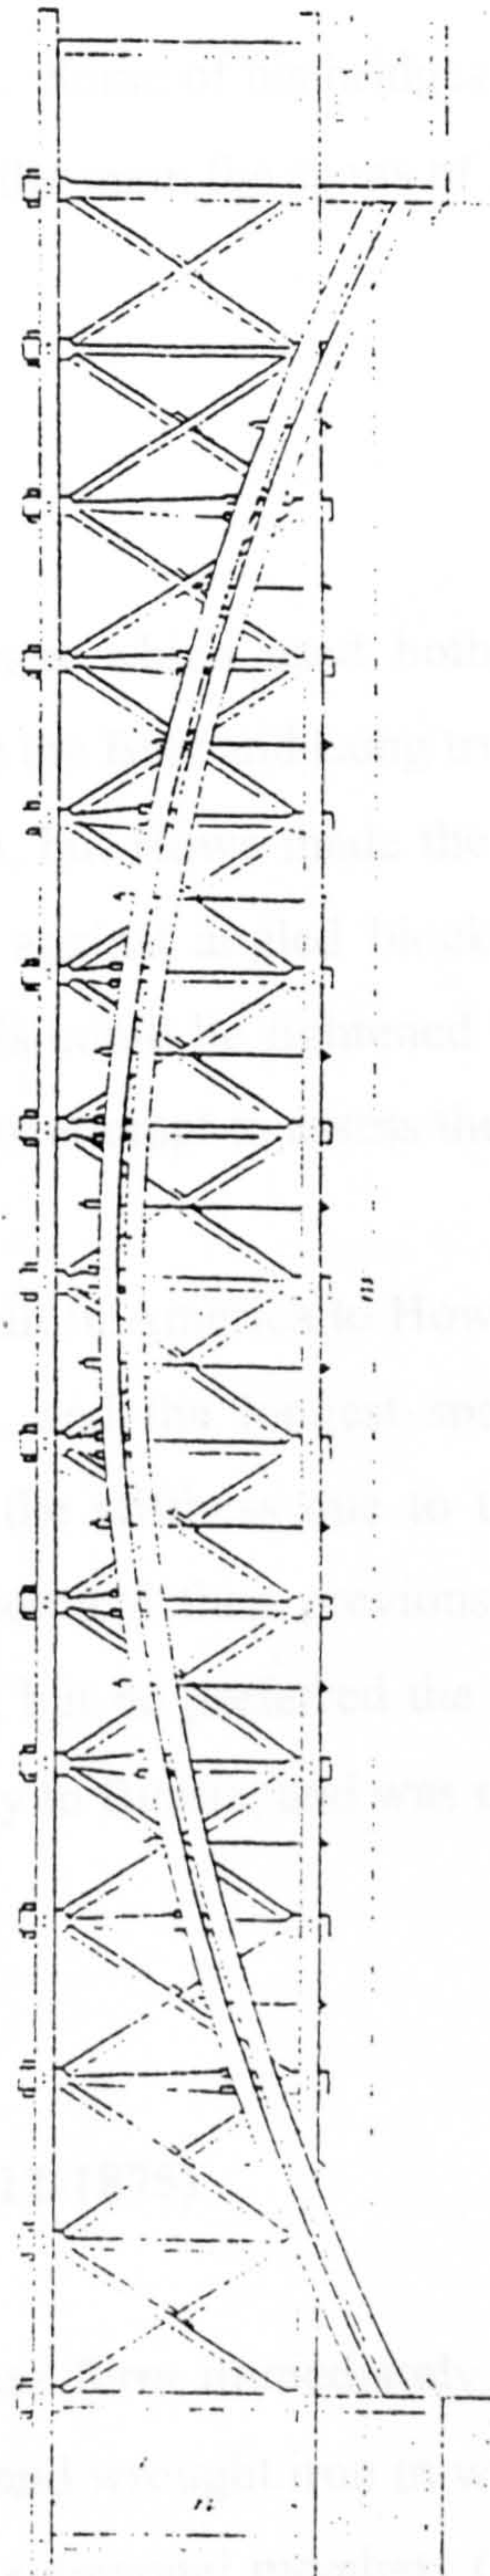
Burr bridge at Bellows Falls, Connecticut River, Vermont.
